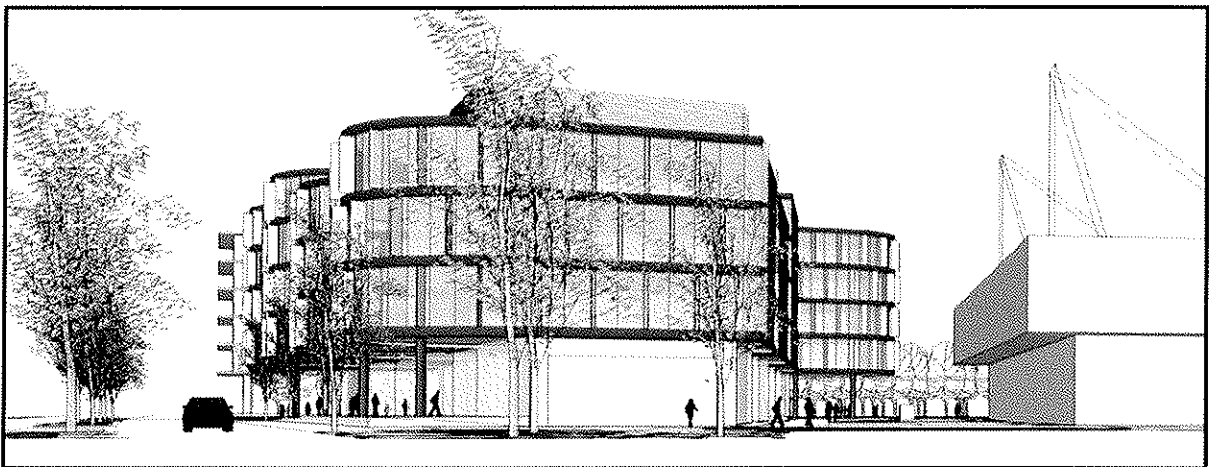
Plant and Equipment setback from Sarah Durack Avenue frontage
